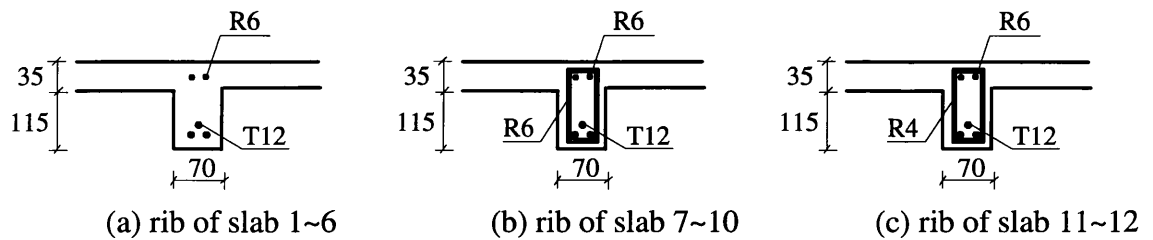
Typical Cross-Section of the Ribs of the Waffle Slabs
